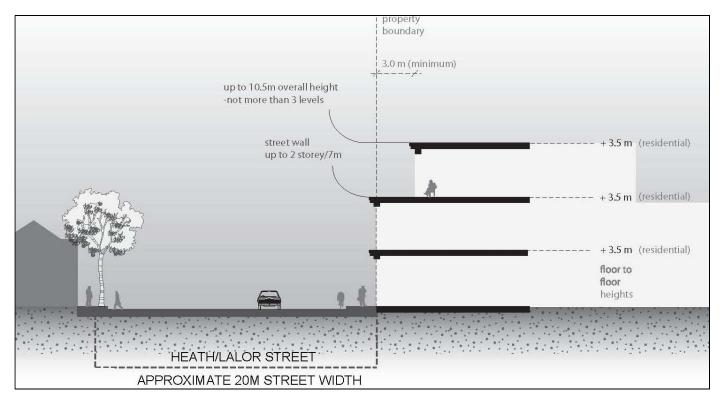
Section diagram showing street wall, setback beyond, and overall height from Heath / Lalor Streets.
